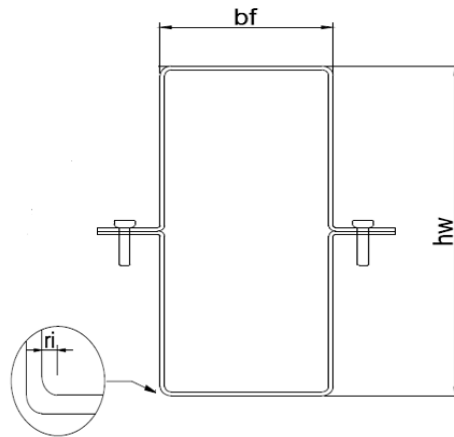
Built-up cross-sectional concept adopted (DH section).
